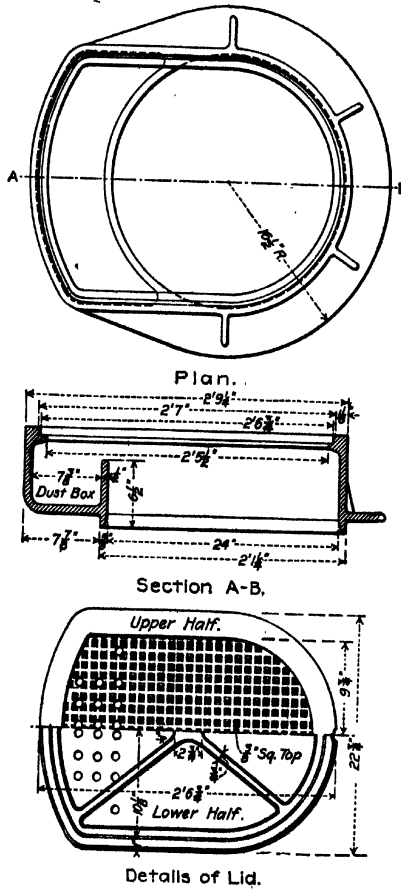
Ventilated manhole cover and frame (Kirkpatrick).
